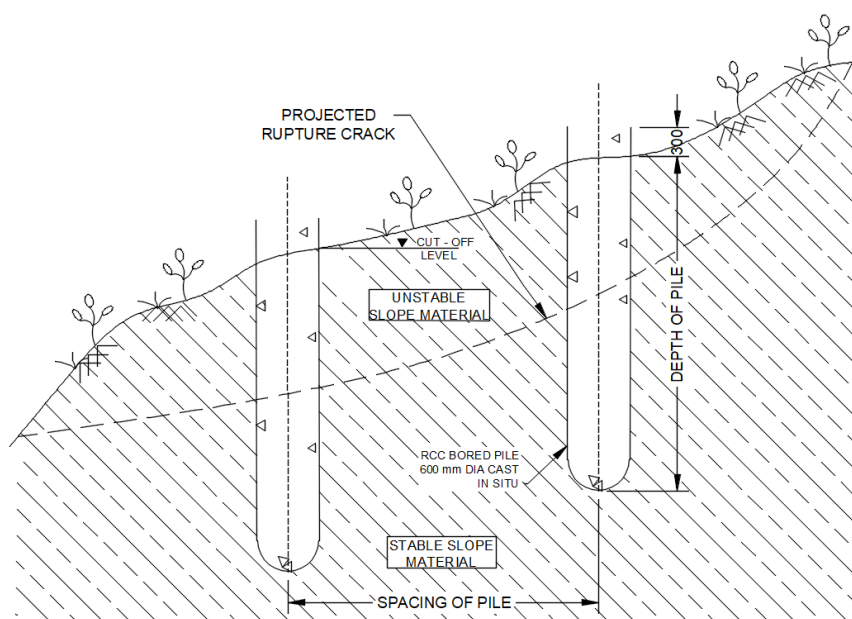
SECTIONAL VIEW OF RESTRAINING PILES TO STABILIZE A ROTATIONAL FAILURE
